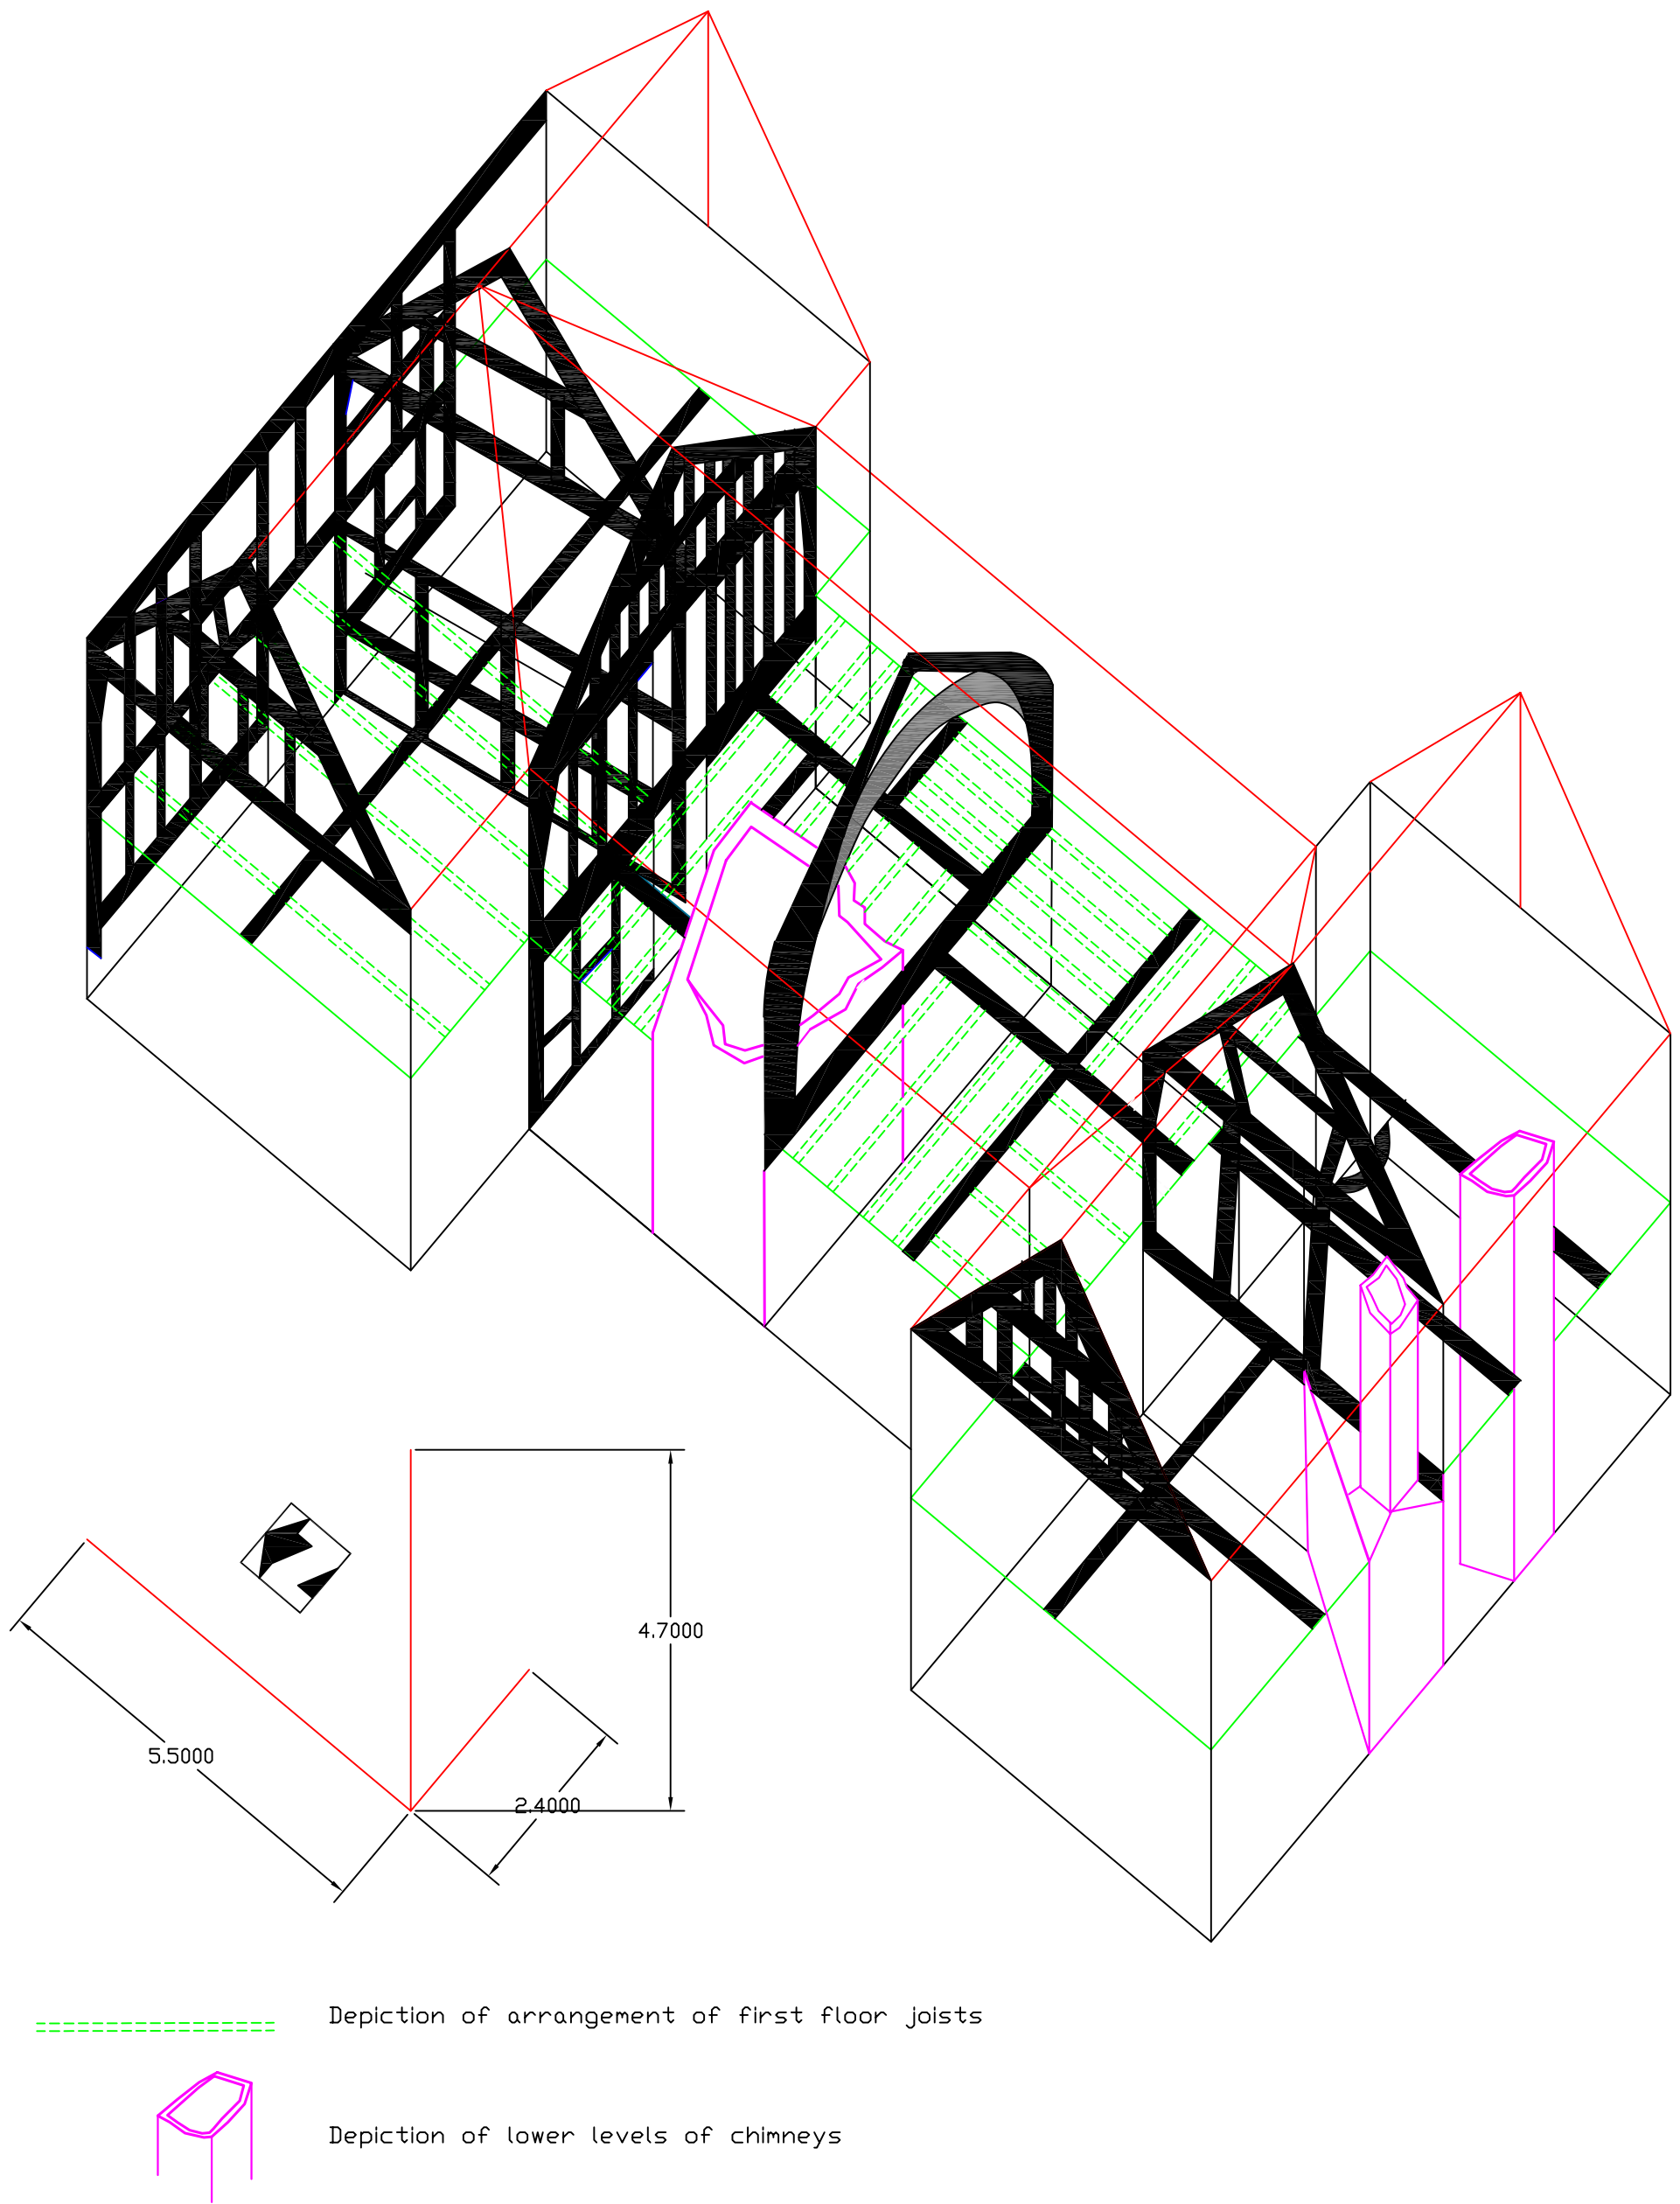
Sketch Isometric Drawing Showing Remaining Significant Timber-Framing
